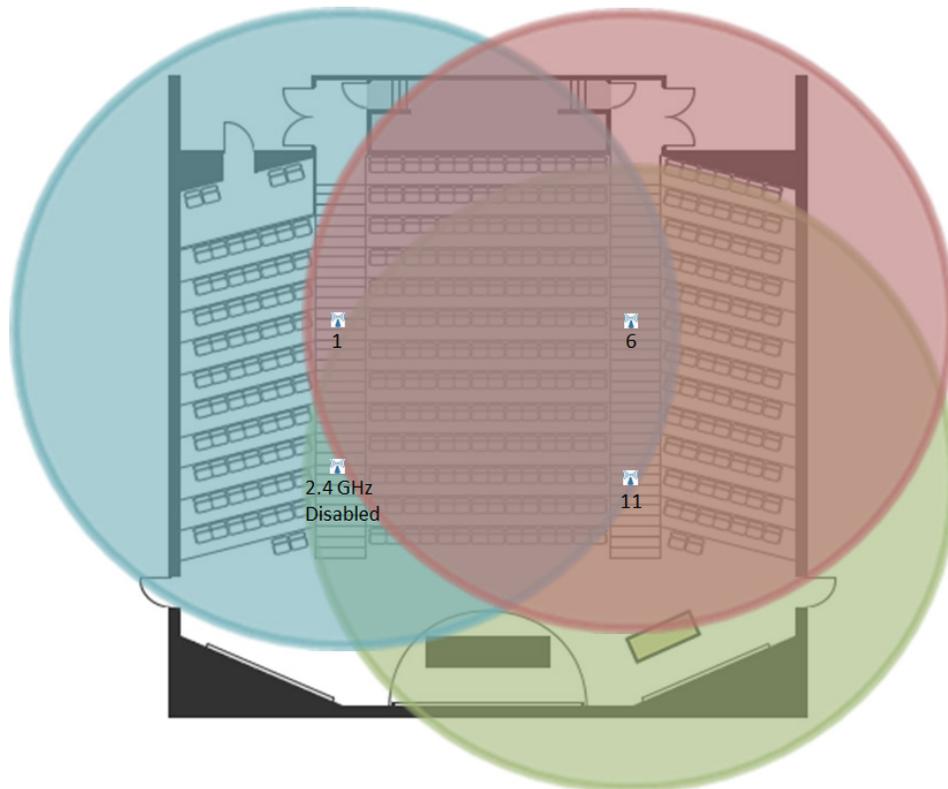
Auditorium AP Placement Plan and 2.4 GHz Channel Plan
